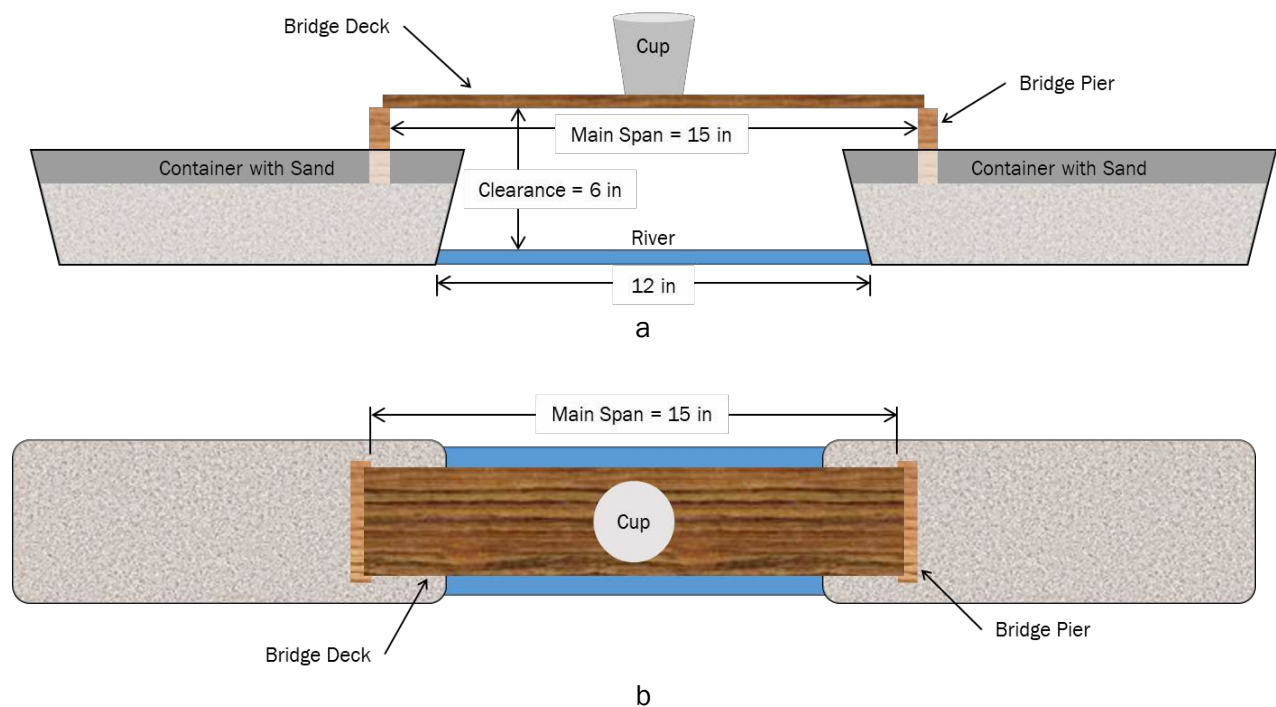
Sketch of bridge construction set-up (a) elevation view and (b) top view
